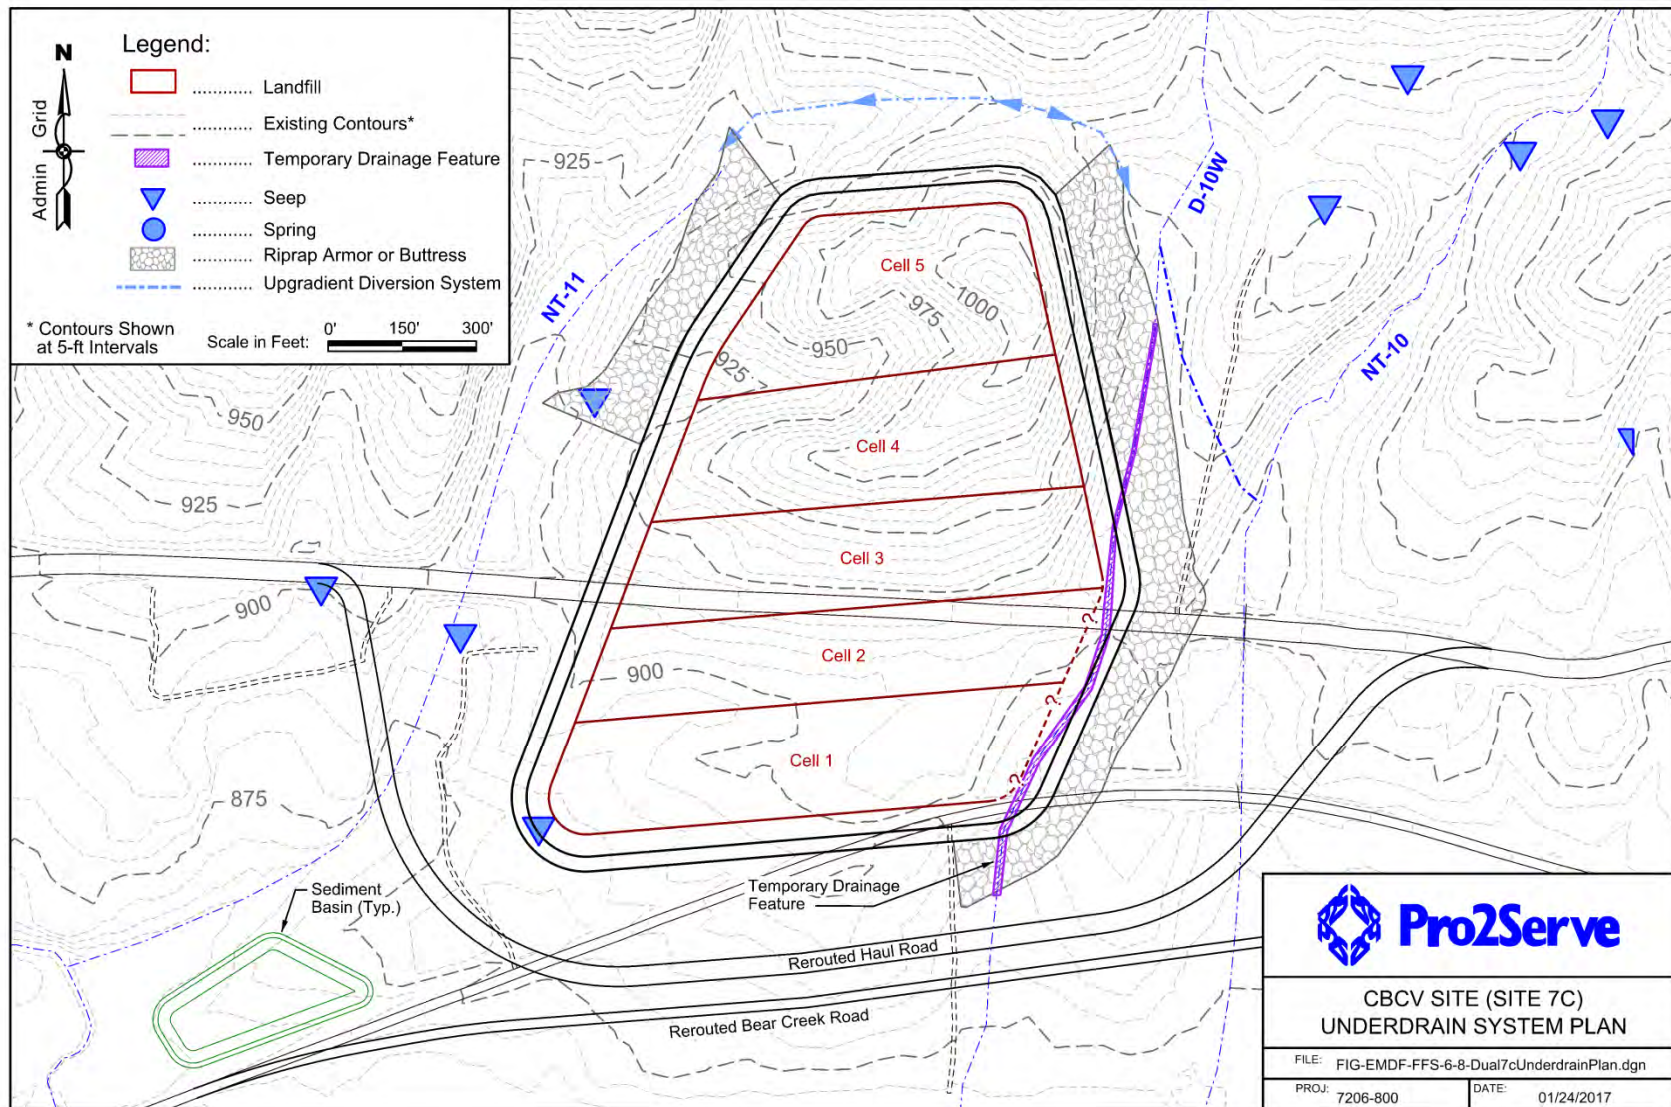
CBCV Site (Site 7c) Drainage System Plan
